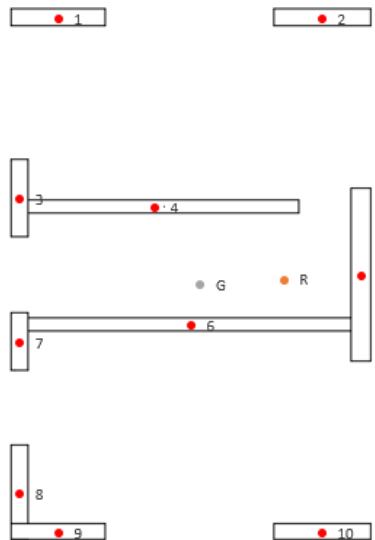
Left building. Non-verified walls: 2,4,5,6,9,10.
